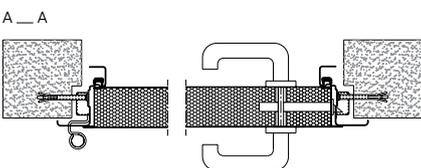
Horizontal cross-section of ECO external seamless steel door with a corner frame without a thermal break
